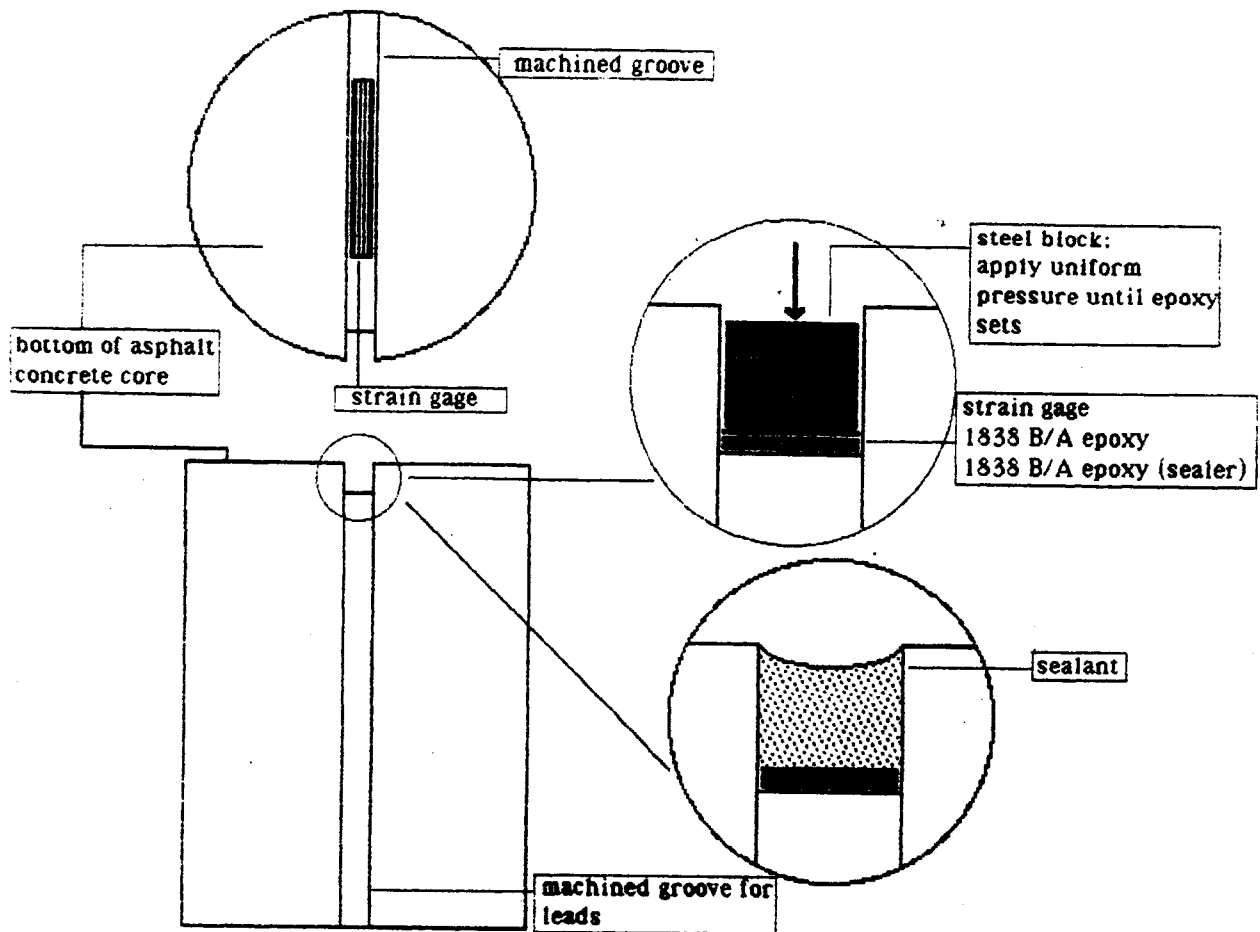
Installing a strain gage on an asphalt concrete core [12].
